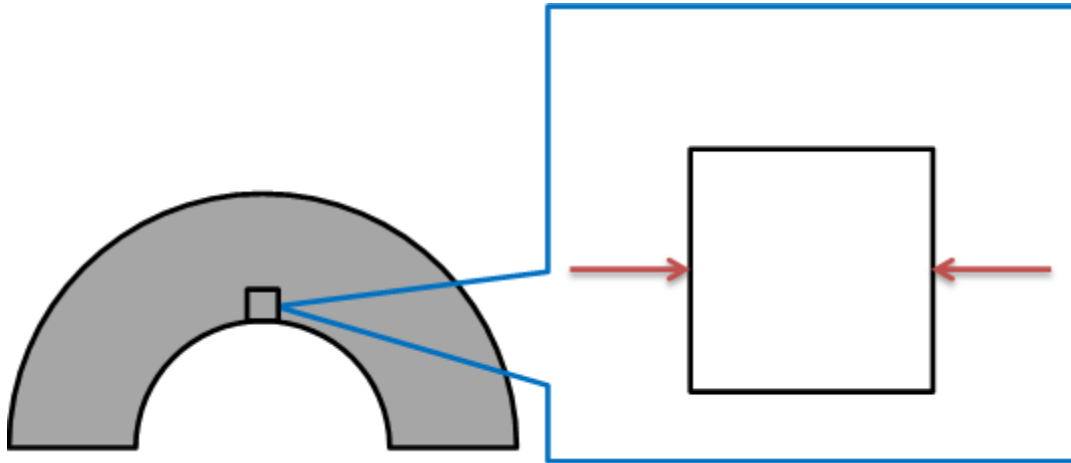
Stress-Block in Hollow Column with One Layer of Transverse Reinforcement
